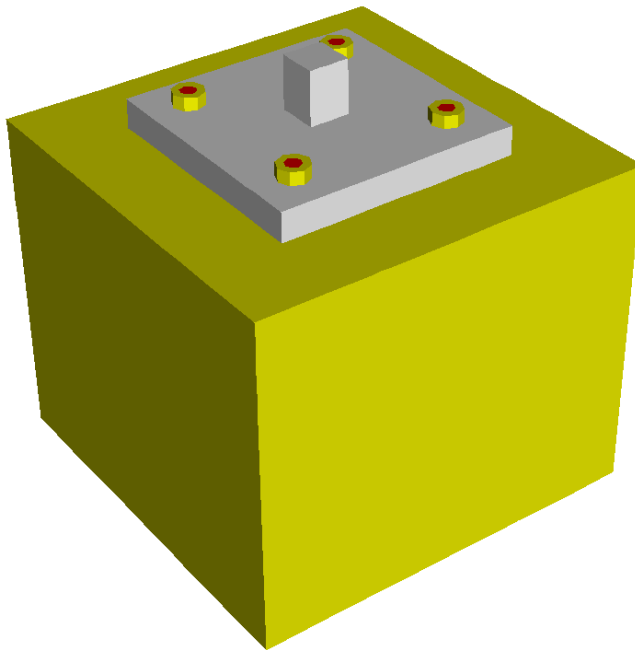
Typical anchoring of the column base plate to concrete model problem
